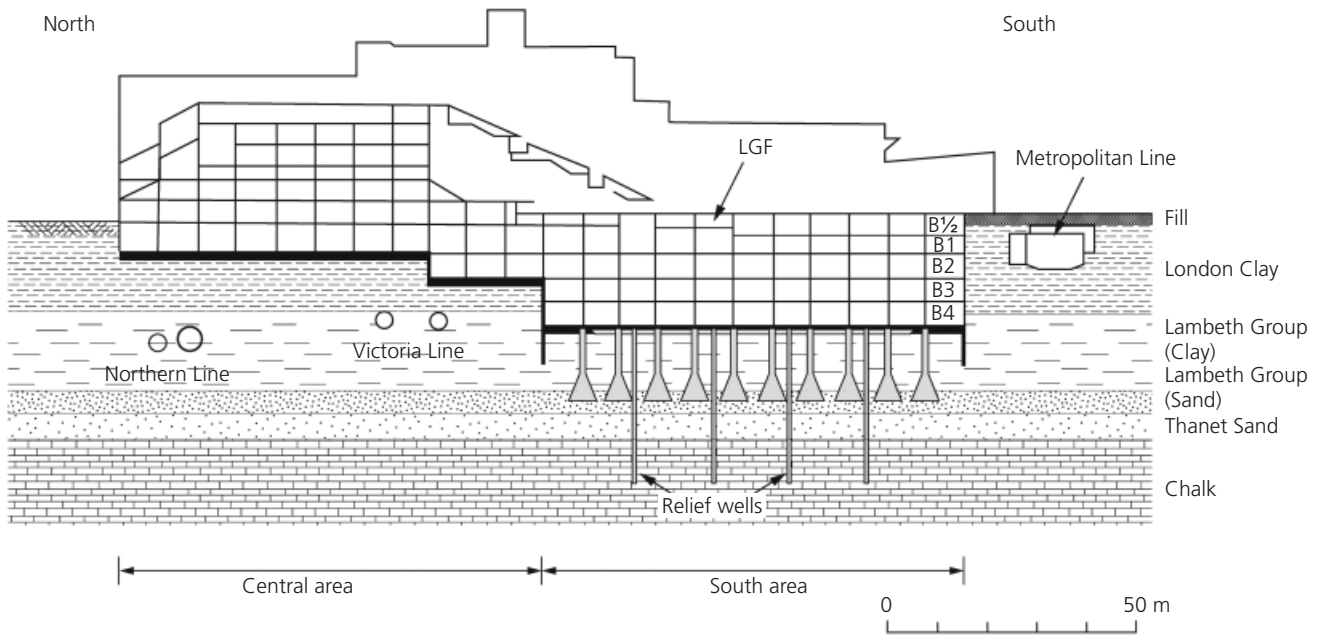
North-south section through the structure. (LGF, lower ground floor)
